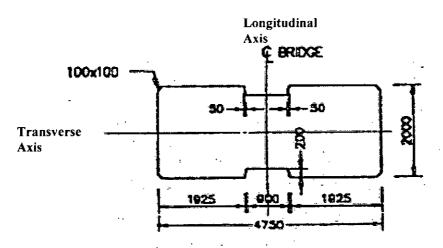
Section of Pier for P9, P10 and P13 (All Dimensions in mm)
